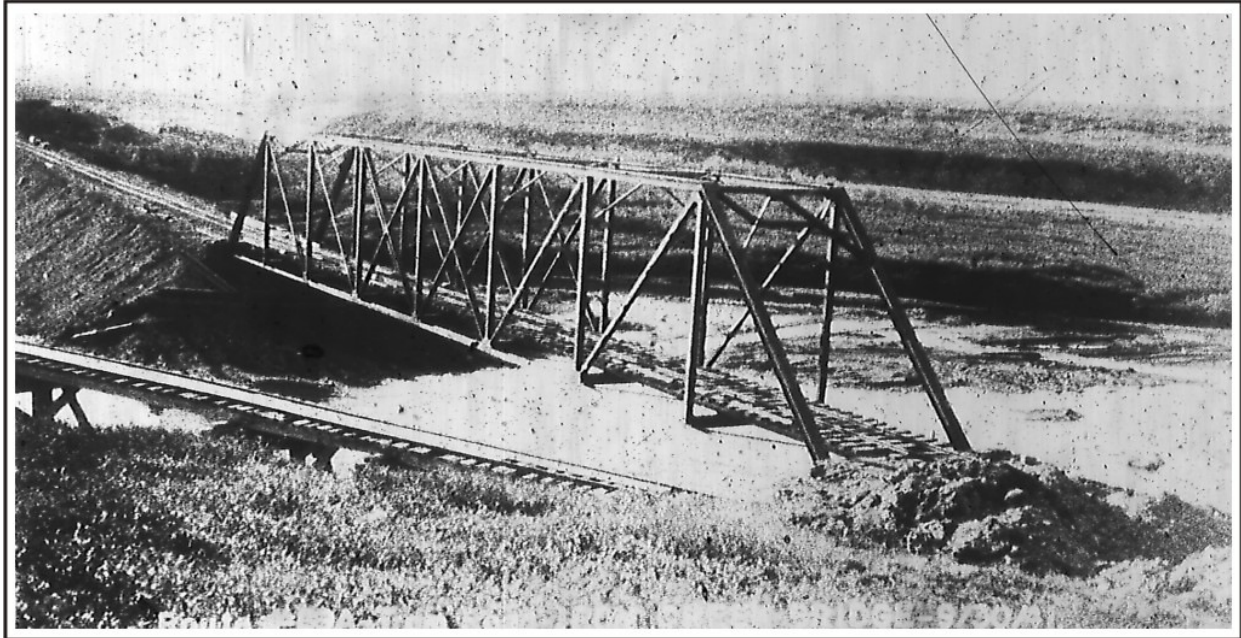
The new timber trestle bridge and the old “A” truss bridge at Ptarmigan Drop at Mile 32 of the Richardson Highway, August 25, 1944. U.S. Alaska Road Commission Collection, PCA 61-21-139, Alaska State Library.
